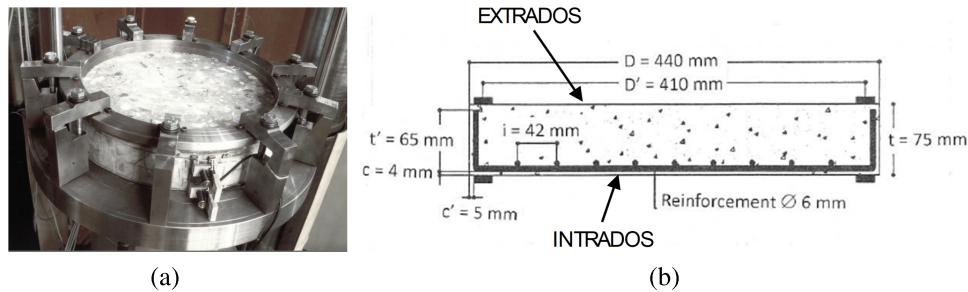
Test Series B: (a) specimen blocked by ten levers and a clamping ring; and (b) reinforcement with a steel net; Specimens B0-N45-H.
